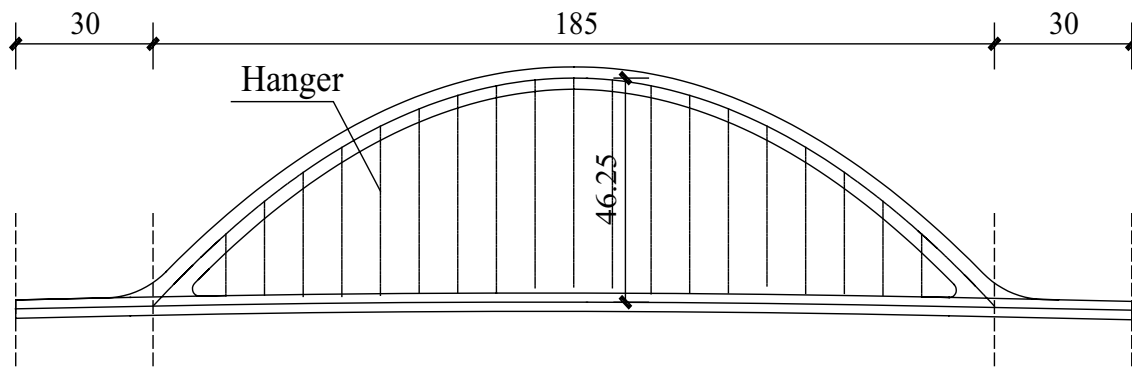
General arrangement of Yuehu Bridge (unite: m)
